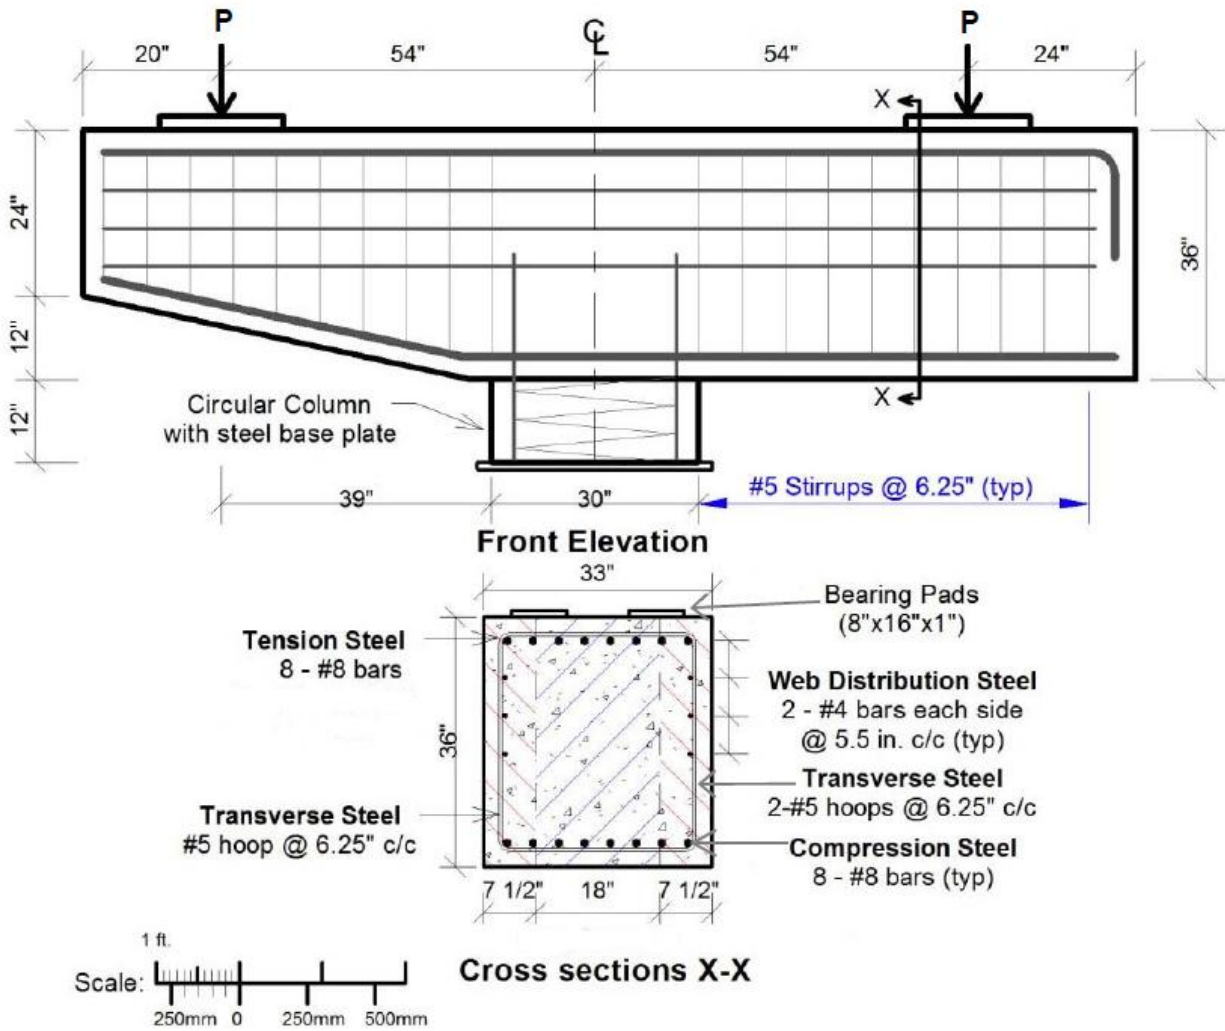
Elevation and Cross-Section of Specimen 2A (Bracci et al., 2000).
